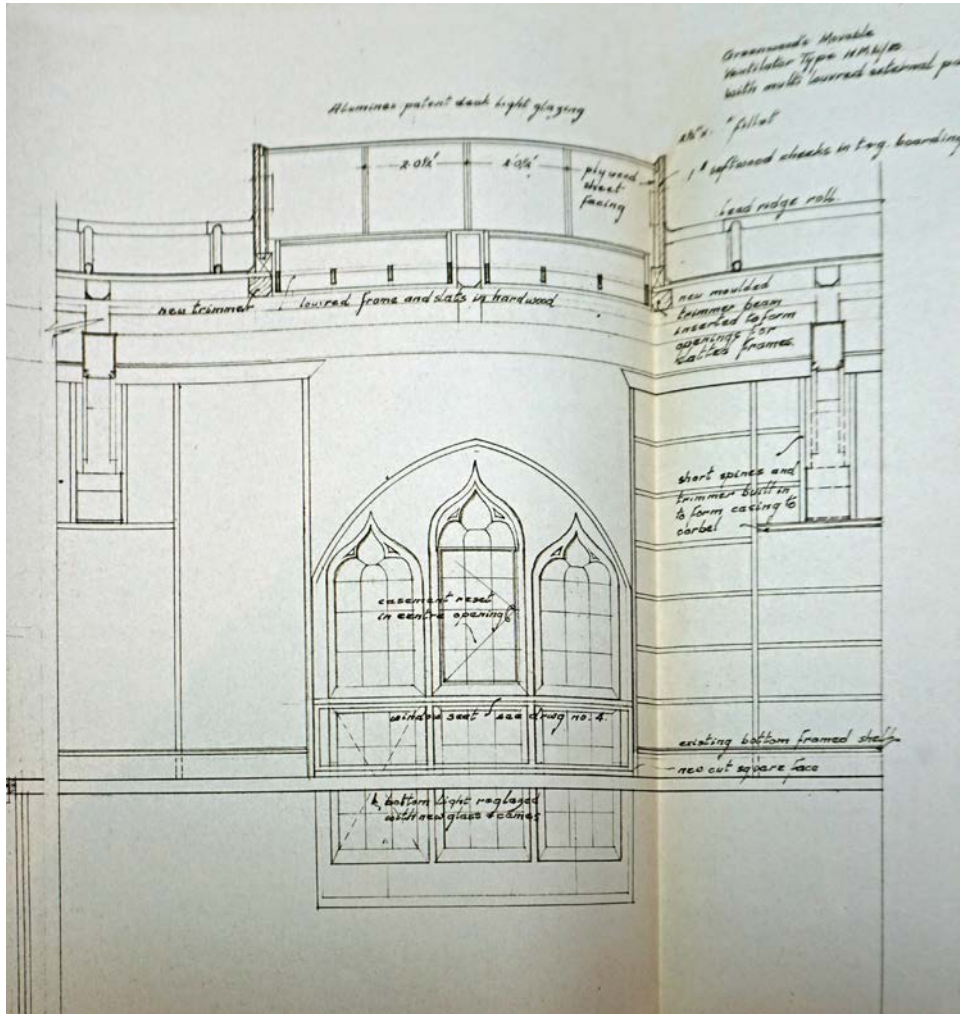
1957 section through the Annex showing the insertion of the mezzanine and rooflights between the original roof structure, Fielding, Dodd and Stevens (Exeter College Archive)
